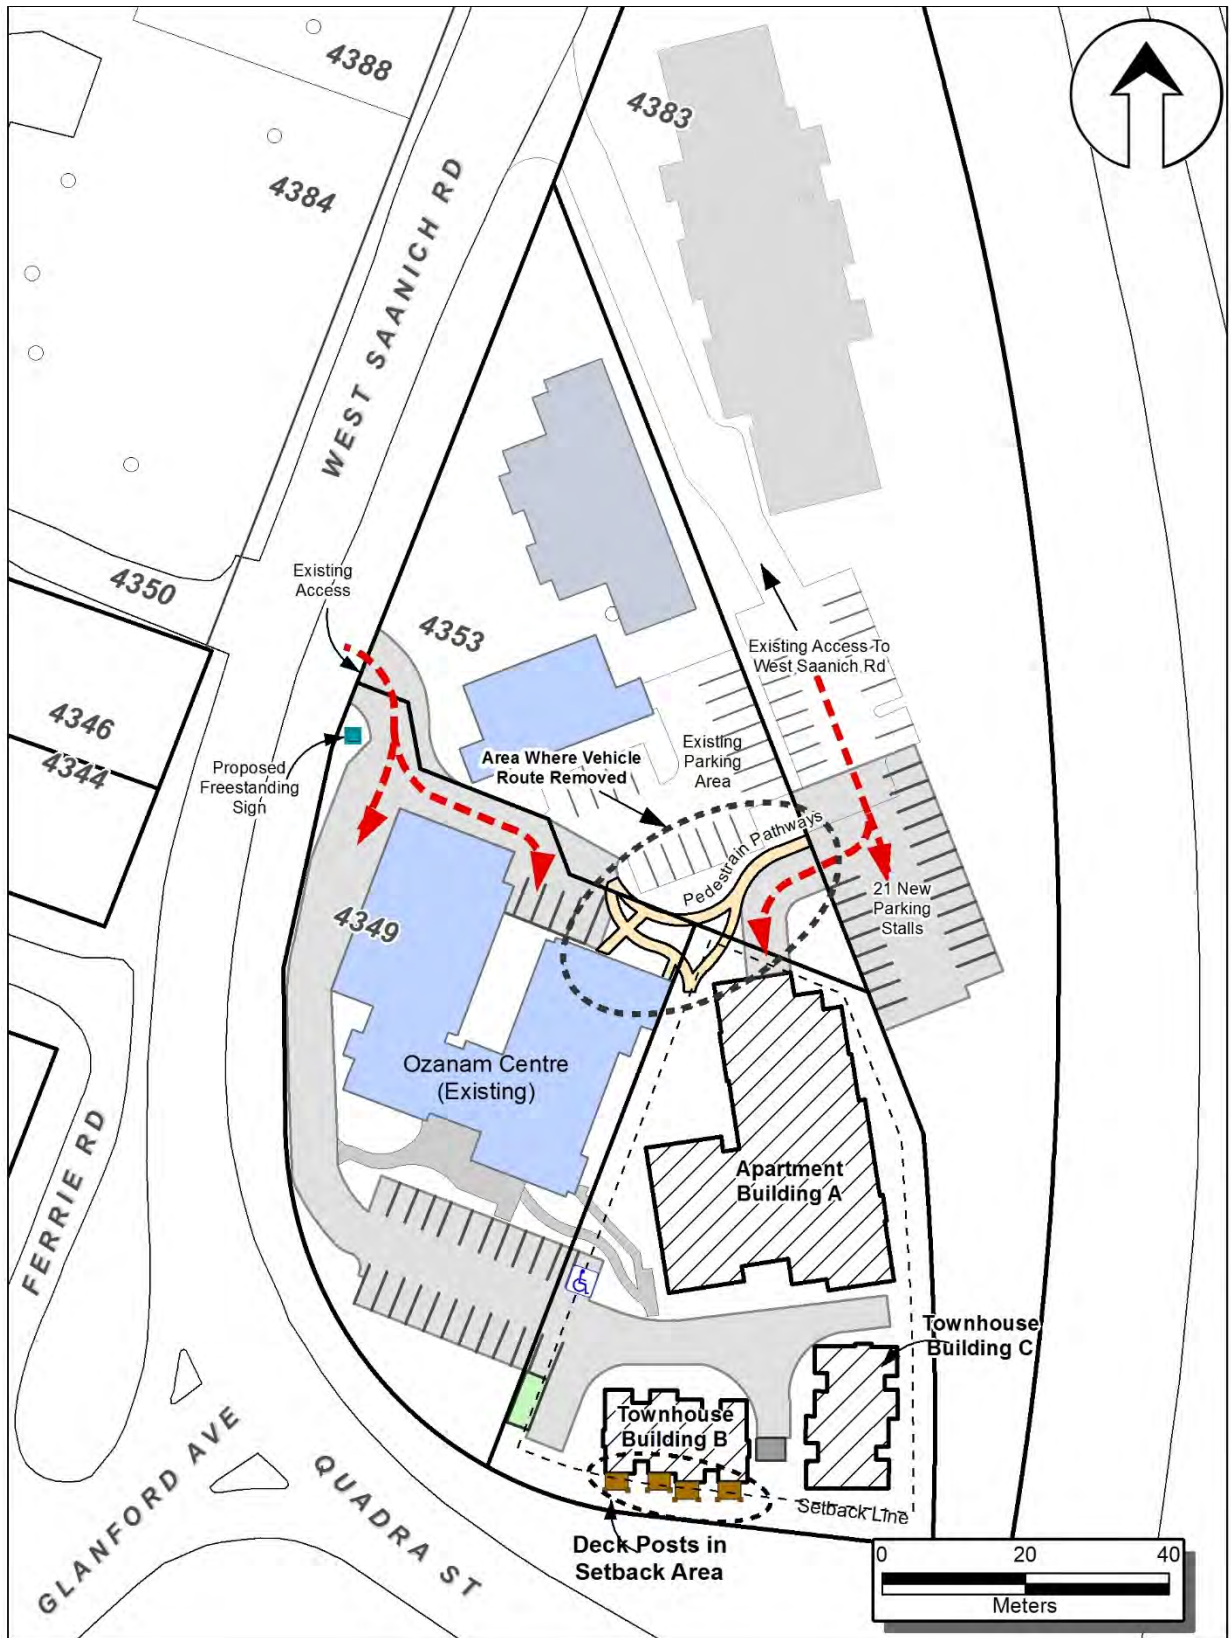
Proposed Site Plan including Proposed Vehicle Routes
